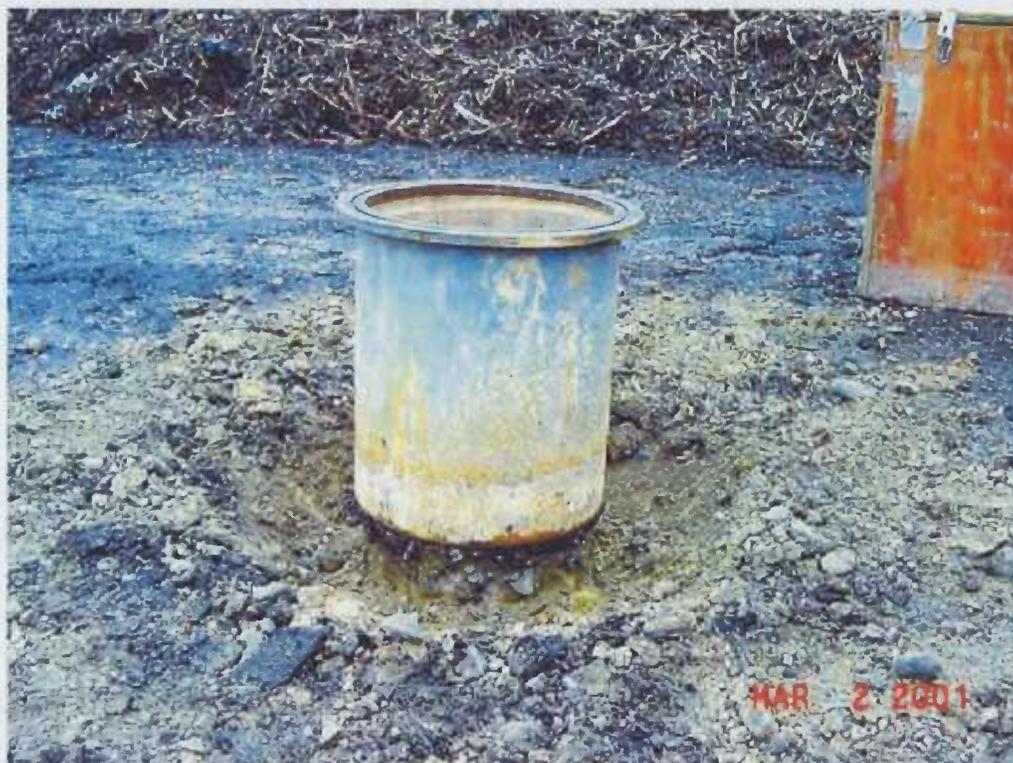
Excavation for SSRI test. Note relatively dry appearance of the excavated soils.
